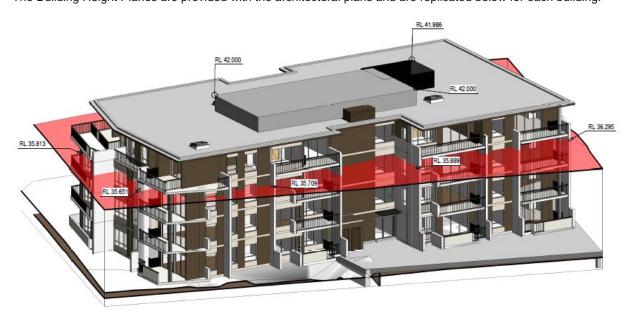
Building Height Plane for Building A (Source: Group GSA)
